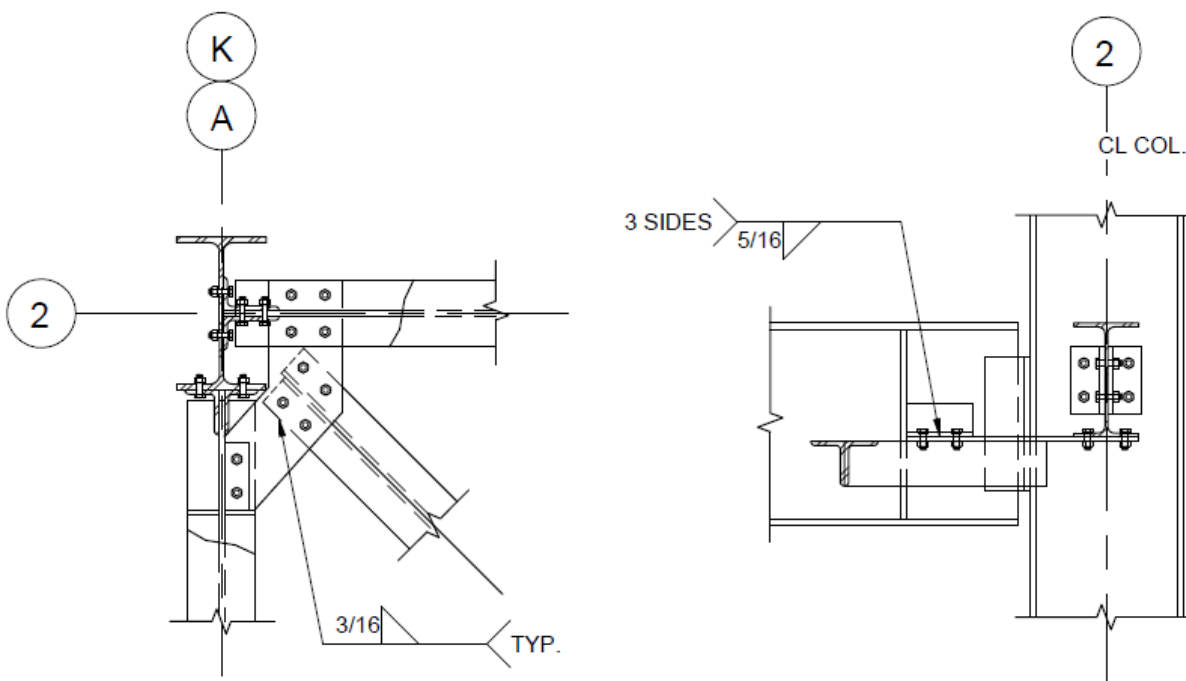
Strengthening of Existing Horizontal Bracing at Lines 2/A and 2/K
